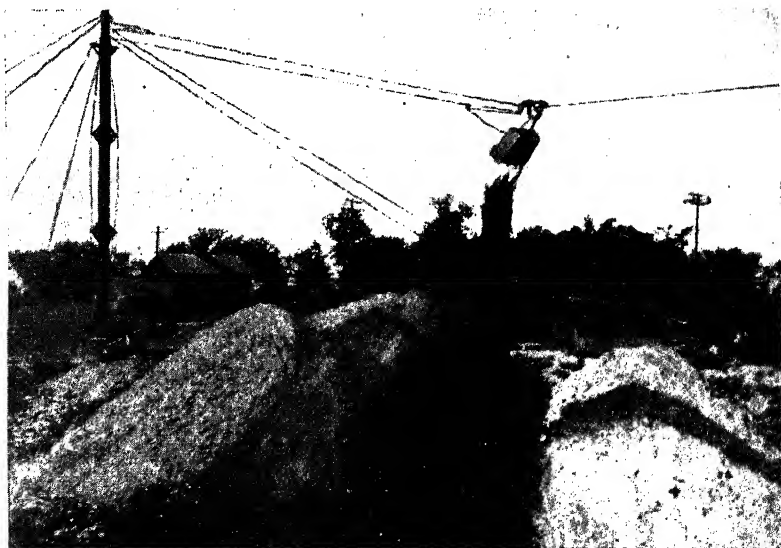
Slack-line cableway excavator. (Courtesy of Saurman Bros.)
